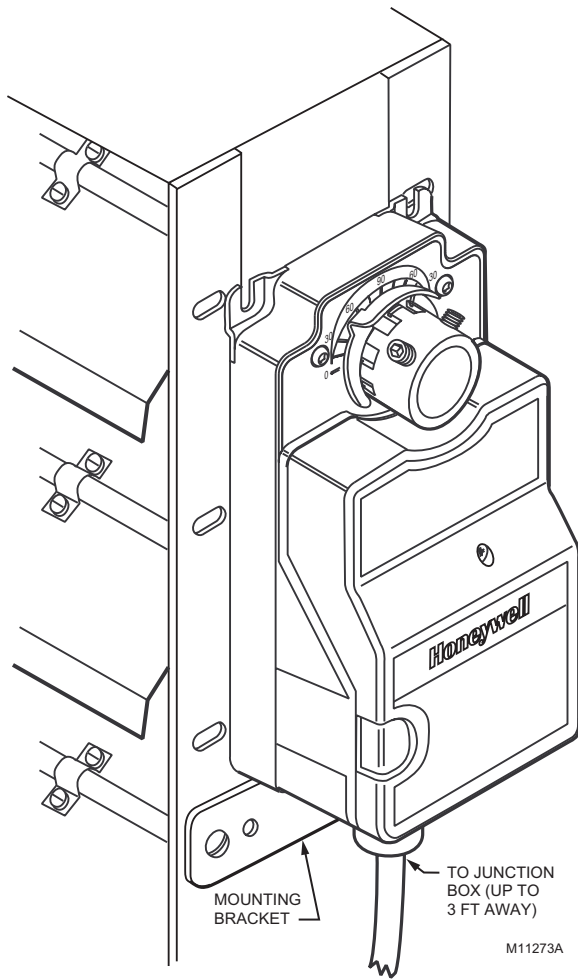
ML6194/ML6294 Actuator standard mechanical connection.
